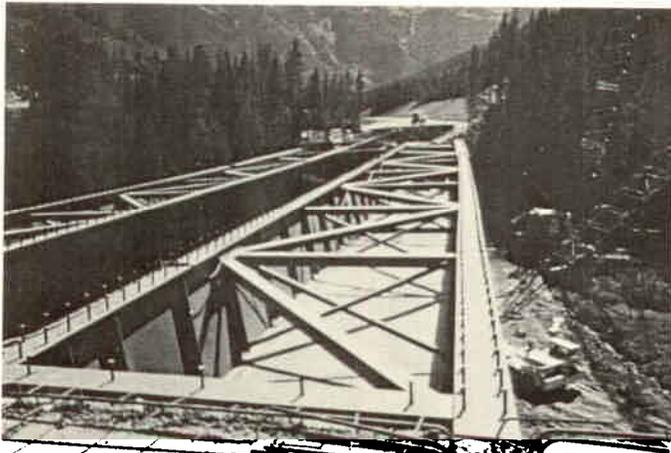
Vail Pass Colorado Bridges: erected steelwork.
